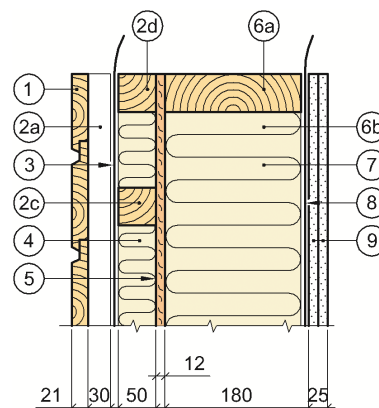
4 show the principle designs of external walls. The wall height is normally adapted to 2.5 m room height. Maximum height of the wall elements are 3.0 m. Maximum length is 16.0 m.
